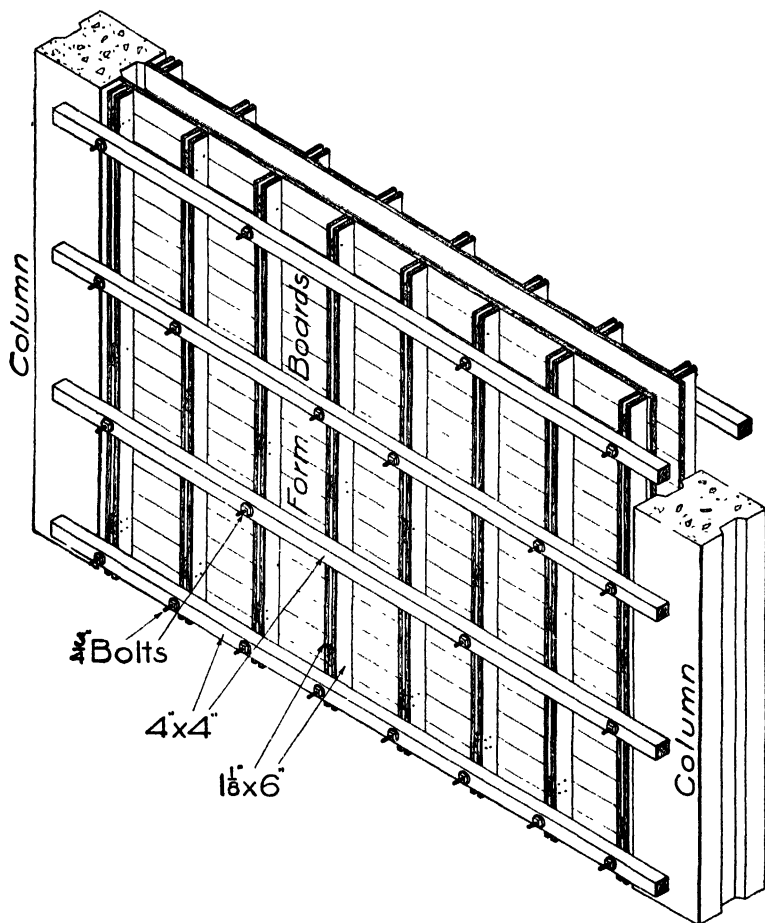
Forms for Curtain Walls Between Columns. (See p. 630.)
